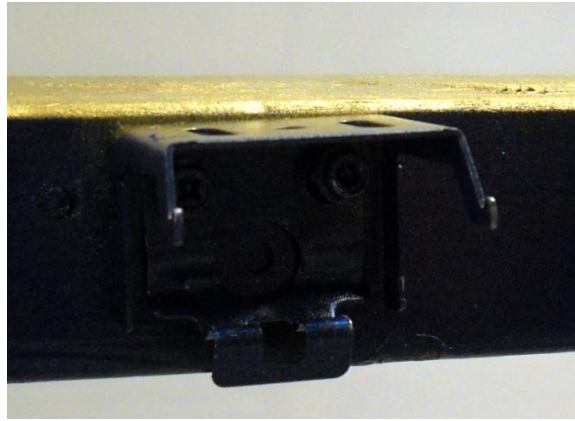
Proper installation of the window blind assembly mounting brackets
